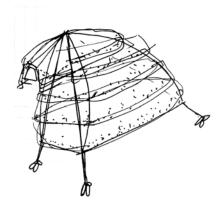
1:10 Structural Model - Plywood Strips, timber sticks, steel wire "bolts" (to allow movement at joints)
